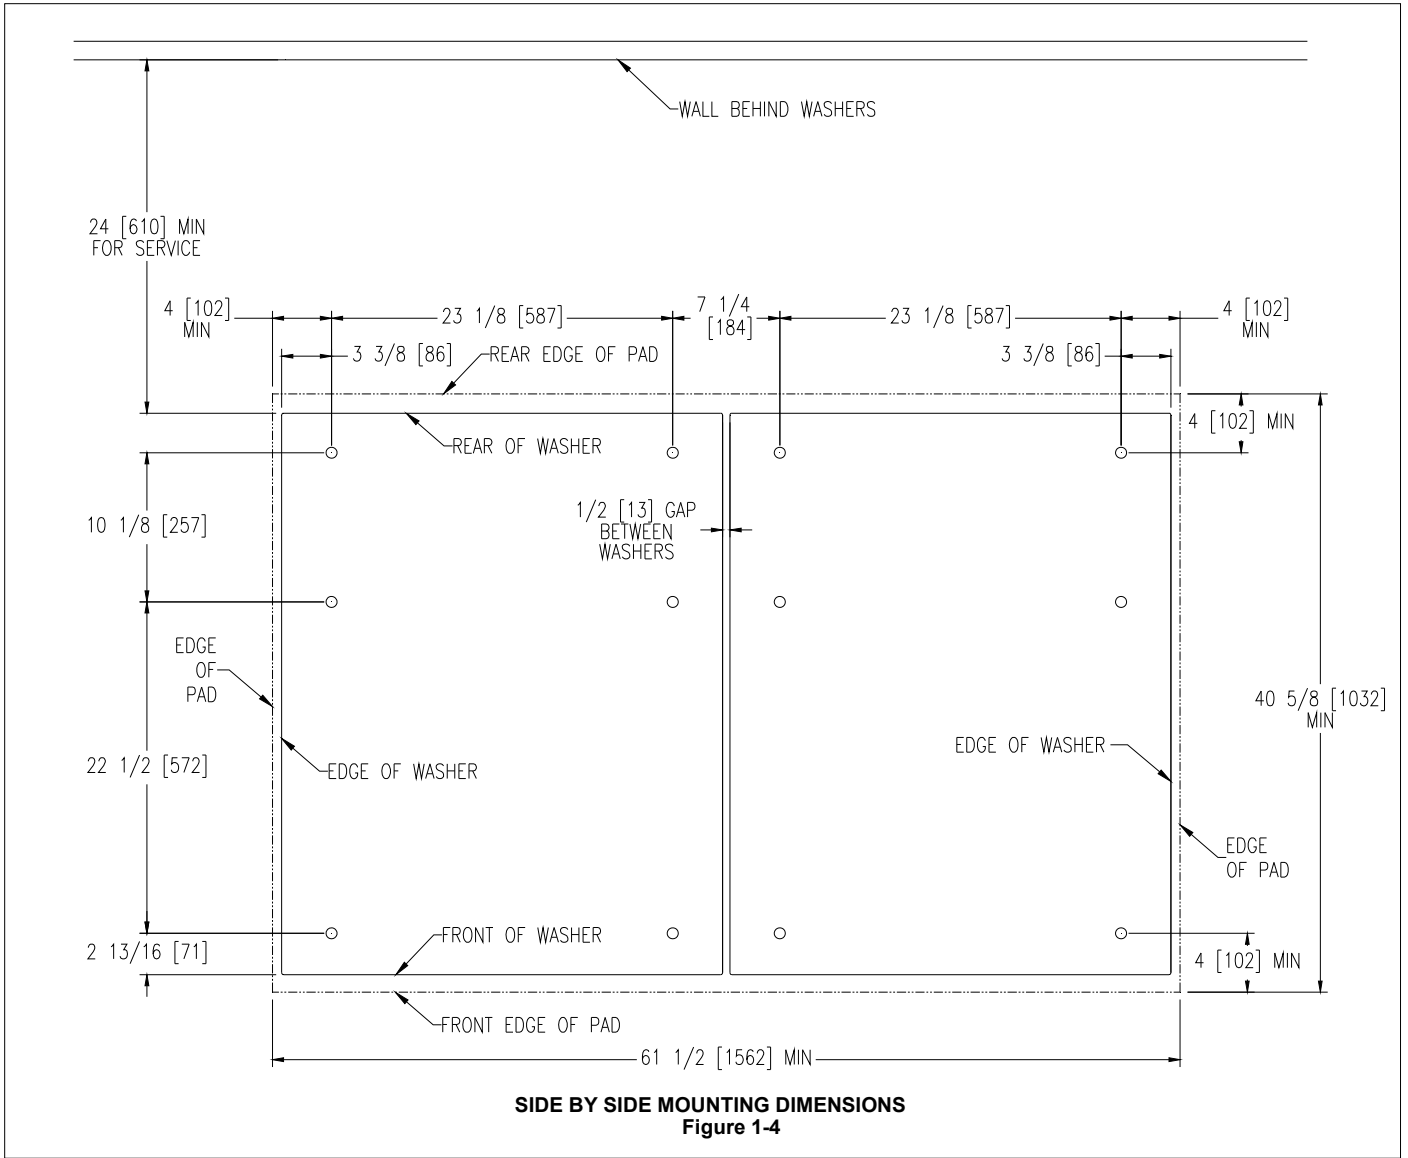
T-650 Machine Side By Side Mounting Detail
